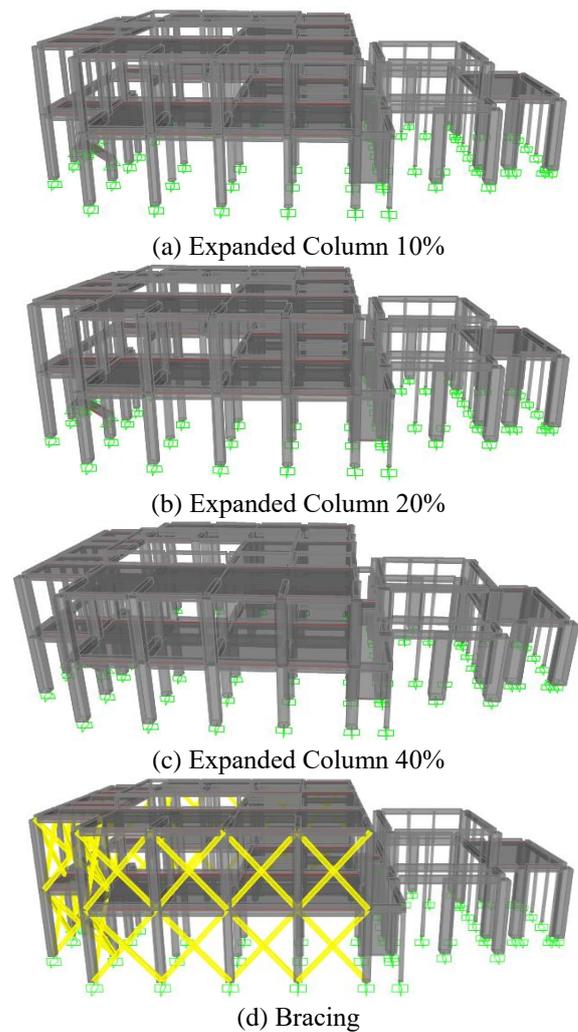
Retrofitting modelling for Baiturrahim mosque
